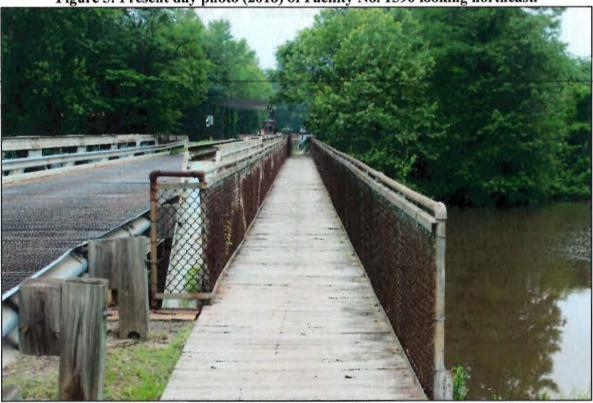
Present day photo (2018) of Facility No. 1590, pedestrian walkway, looking east.
